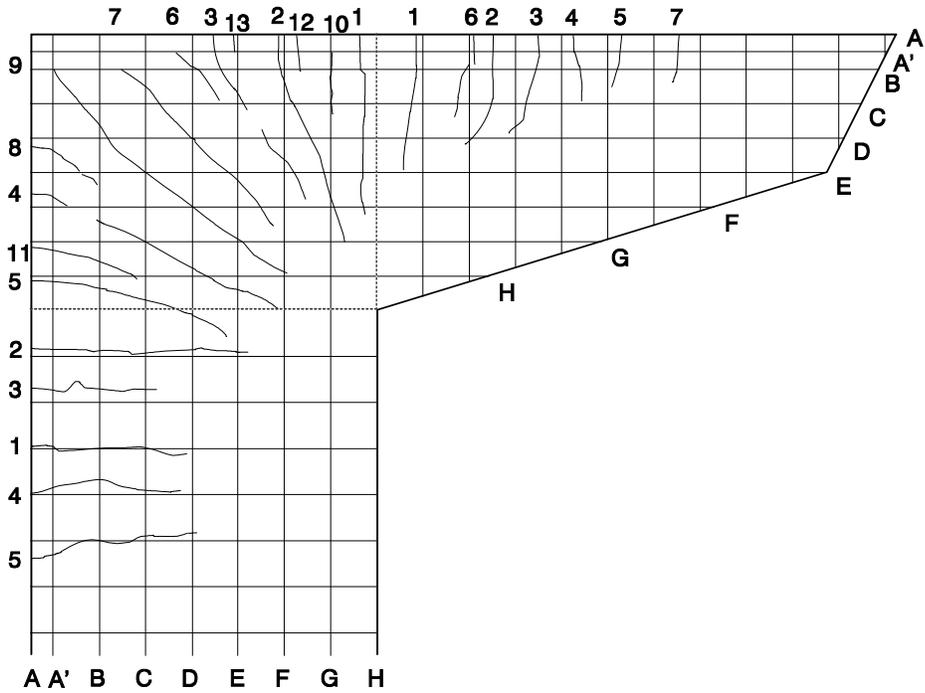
POJ-RC-100-TH cracking pattern on north face of specimen at service load
